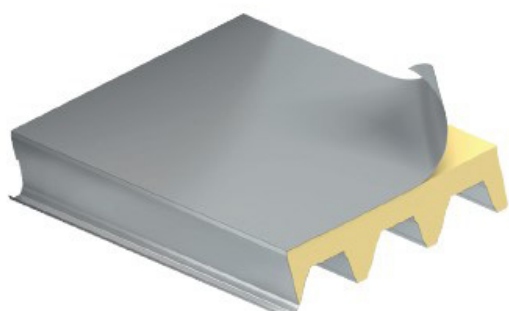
A: Kingspand X-dek 106, 1,5 mm PVC top
